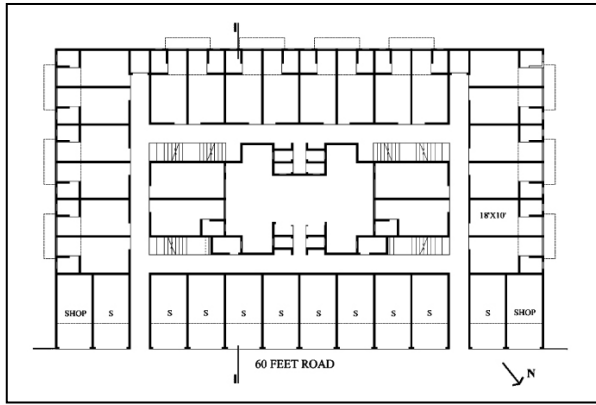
23. Floor Plan of Dharavi Project, 1996 (Mukhija 2002).
